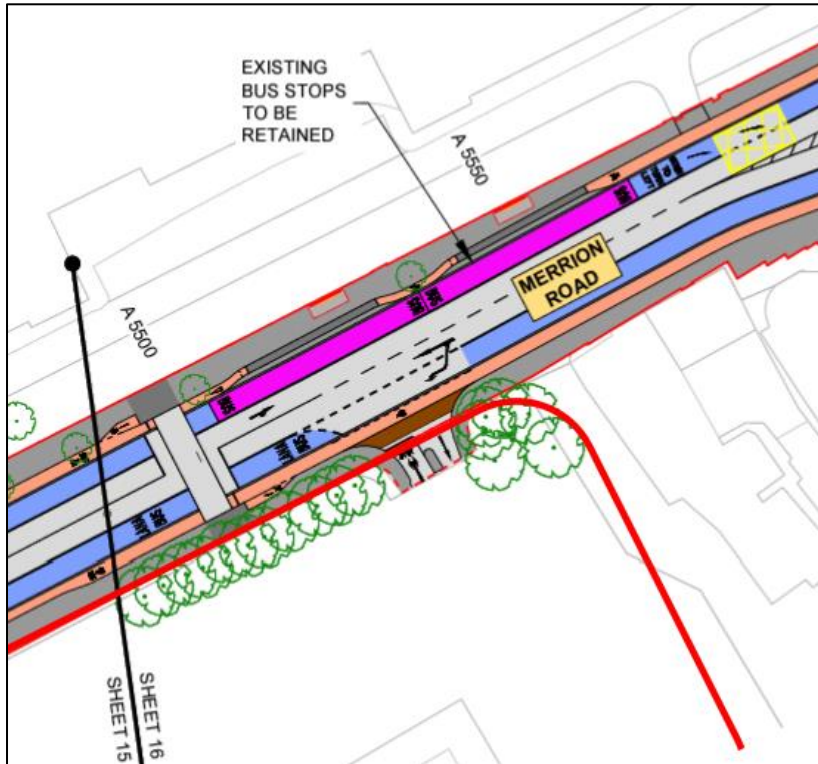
Proposed new Layout at Meta, Merrion Road
